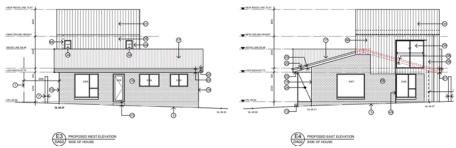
Proposed East/West Elevation Plans (source: Applicant)
